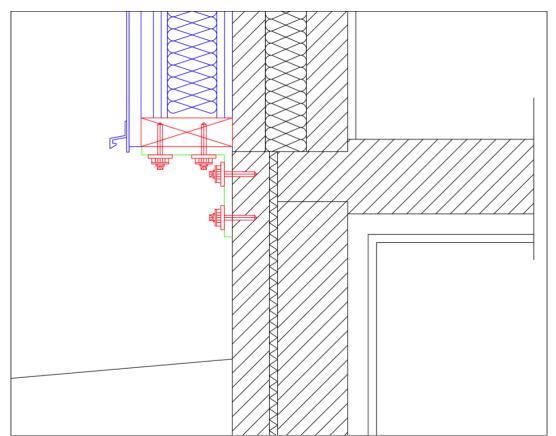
L-brackets are placed at the lower part of the prefabricated faced that is fixed onto the existing building facade and are carrying the Multi-active prefabricated facade element.
